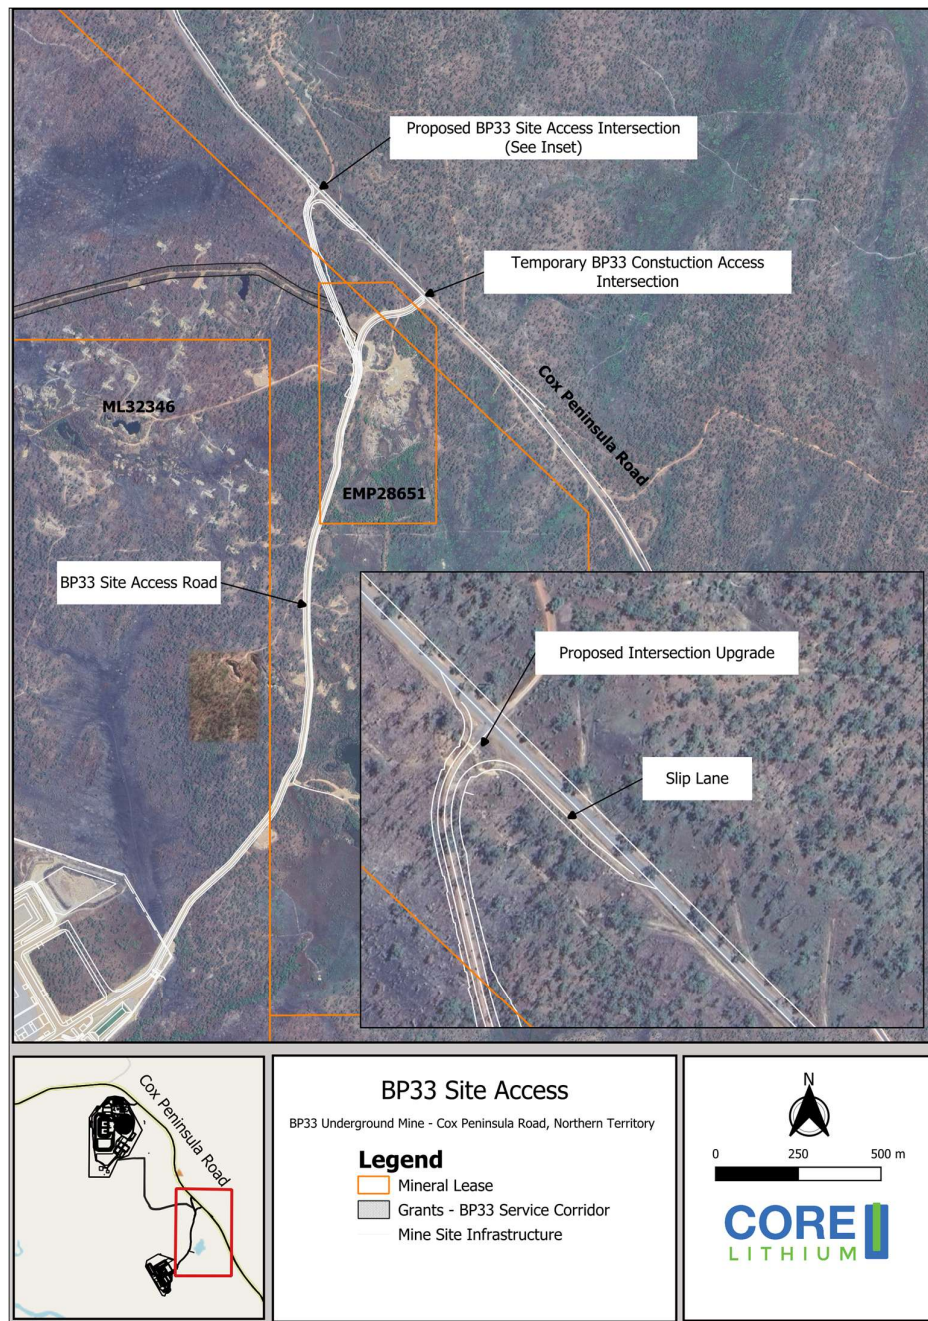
BP33 General Arrangement - BP33 Site Access Road Layout Map
